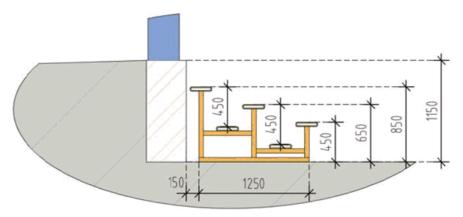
Cross section of the proposed tiered seating in relation to the existing sandstone retaining wall behind. Note - The blue column on top of the retaining wall is the commencement of a light pole which is located just in front (to the south) of the seating area.
